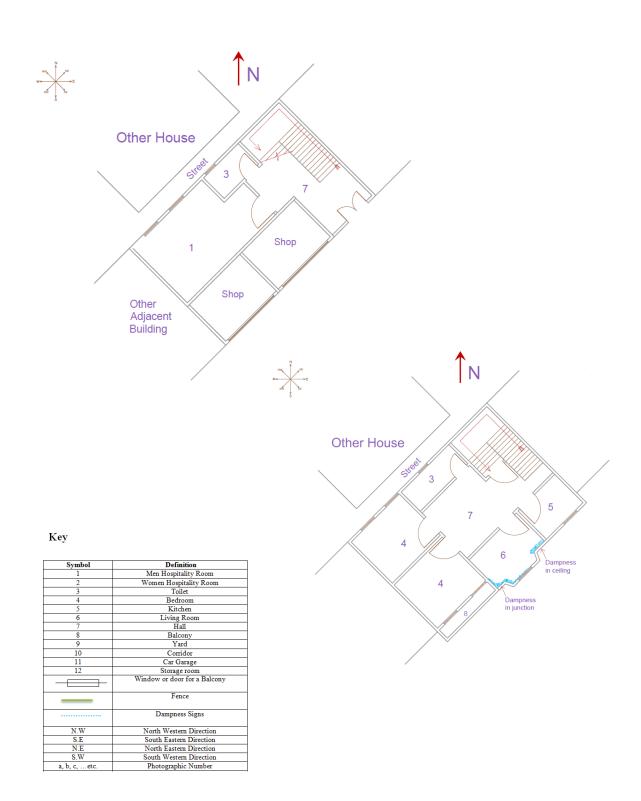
Ground floor and first floor plan of house 6, Al Gareda quarter, Albeida, Green Mountain, Libya
